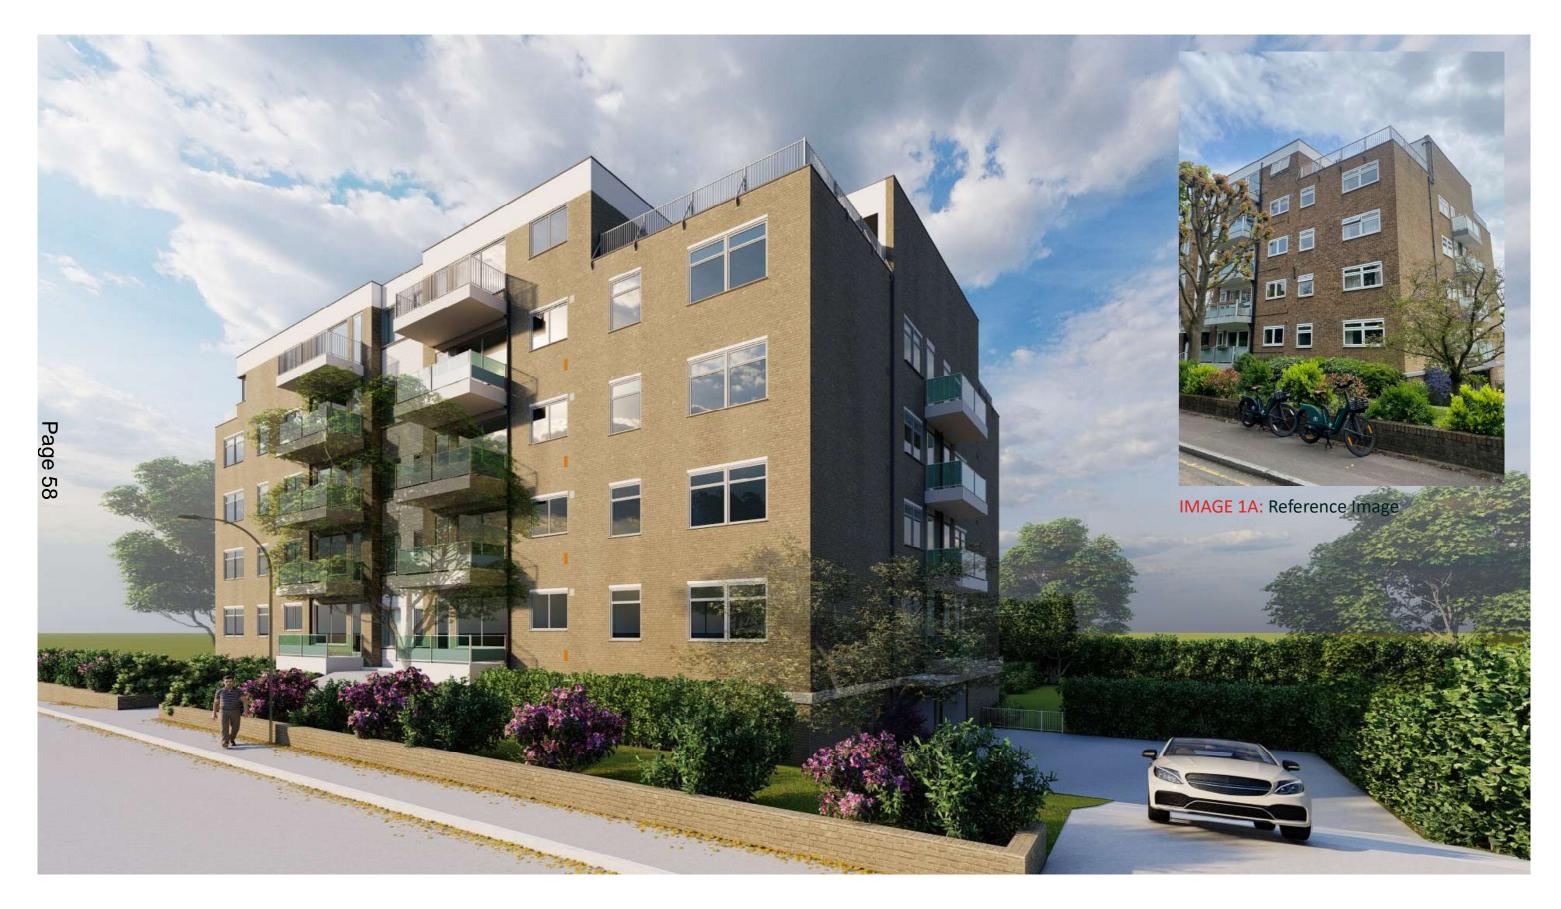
Existing street level view of 18 Sovereign House towards the near front corner of the property
